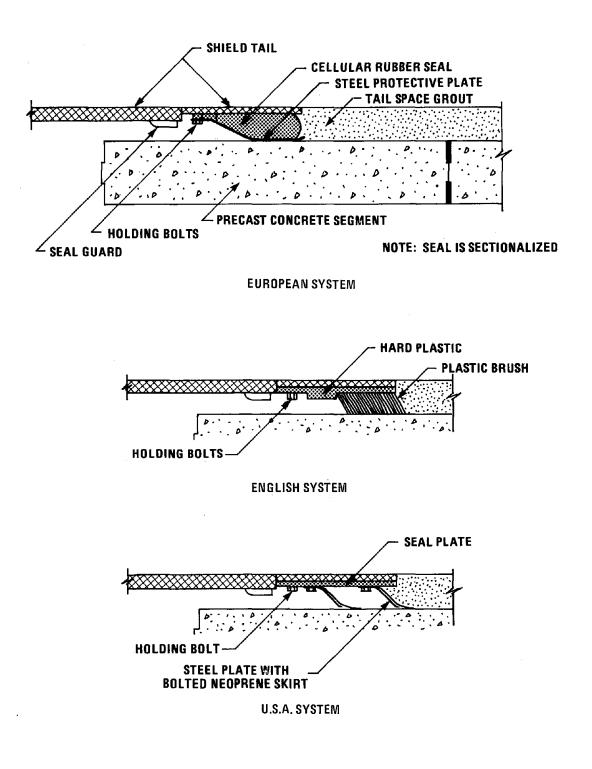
TYPICAL TUNNEL SHIELD TAIL SPACE GROUT SEALS
